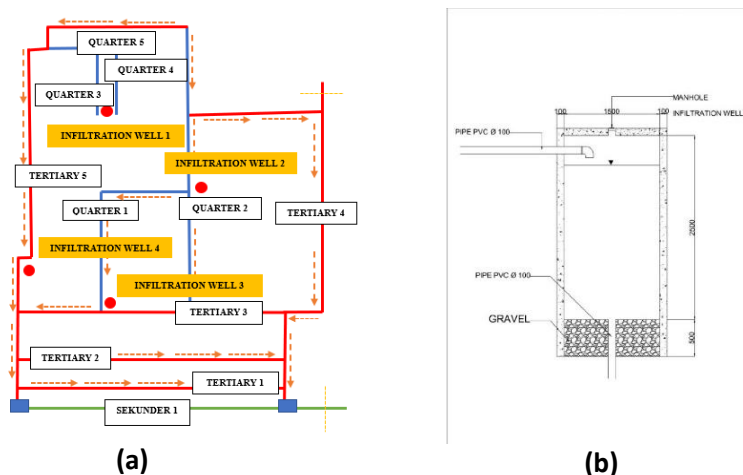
Drainage system and location of infiltration well (a), detail infiltration well (b).
